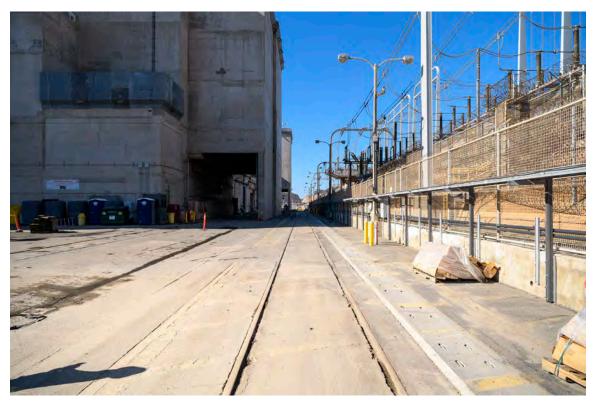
End of On-site Rail Spur (Looking South) (2022)
